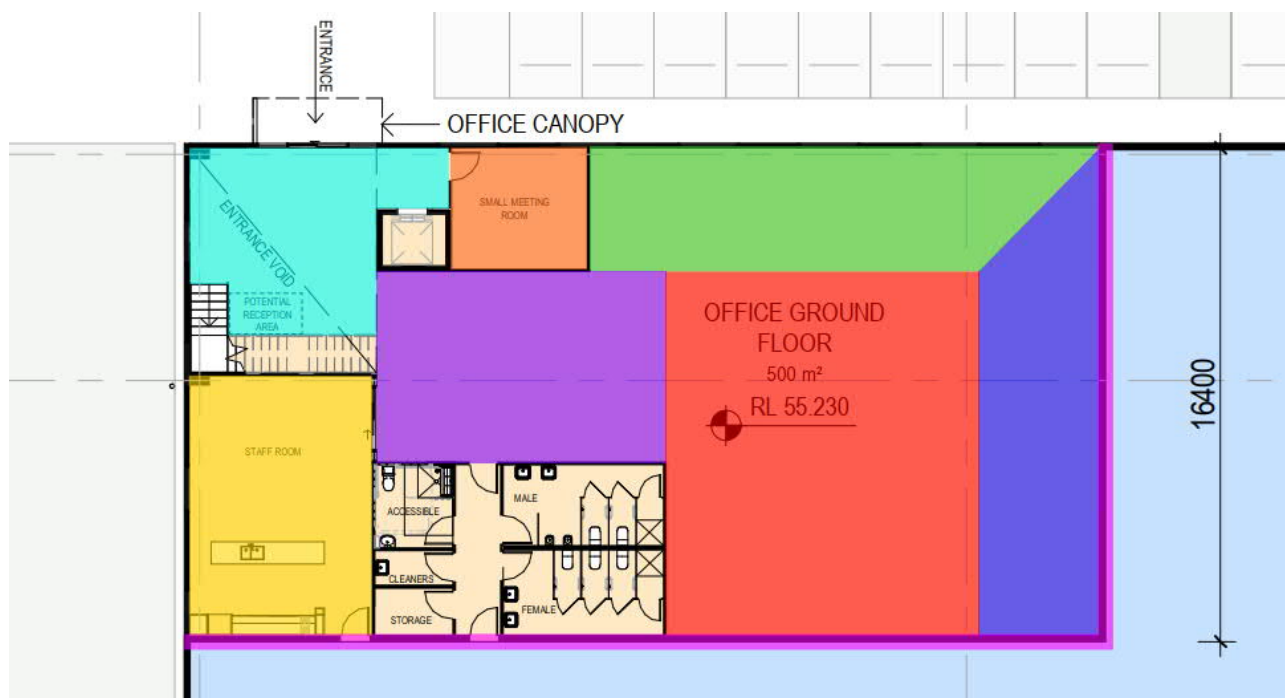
HVAC zones & thermal envelope for 1500 Centre Road Ground Floor
